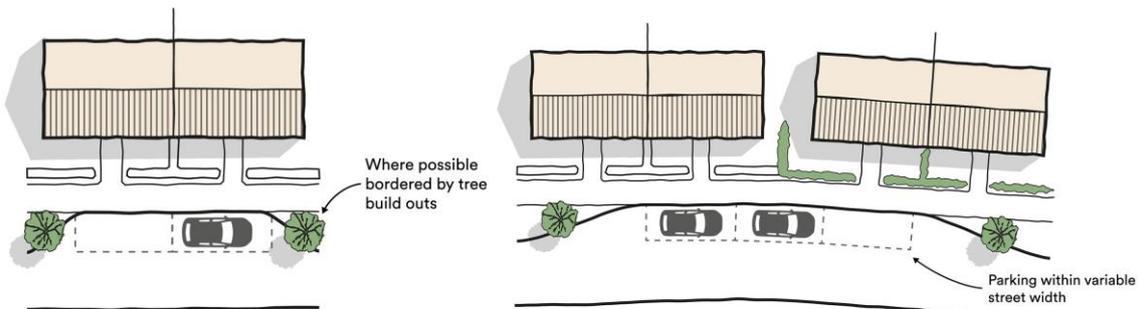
Formal on-street visitor parking (left) and informal Village Area Type visitor on-street parking (right)
